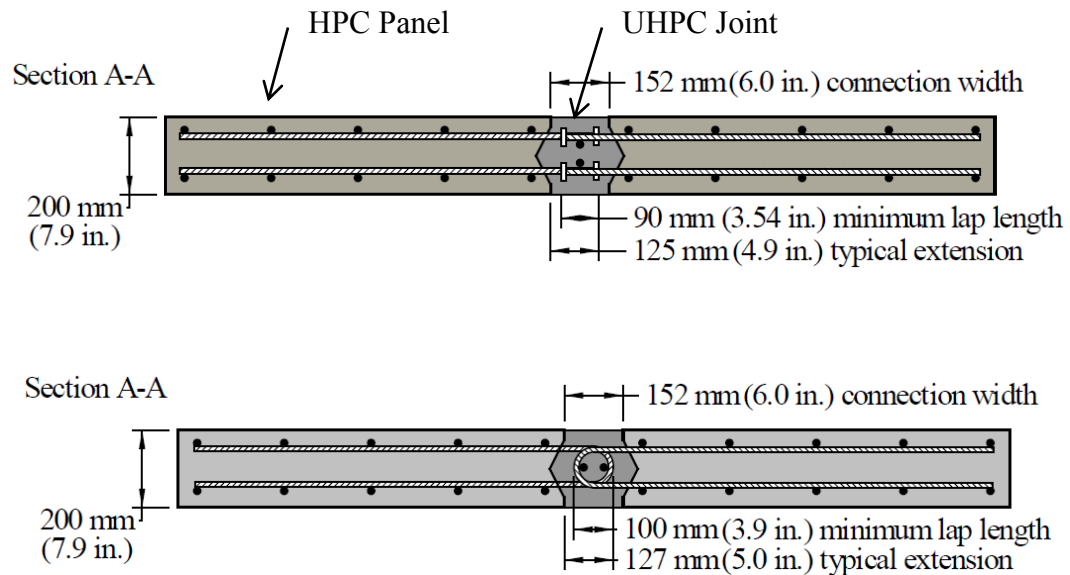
Section of Transverse Joint from Constructability Test (Hartwell, 2011)
